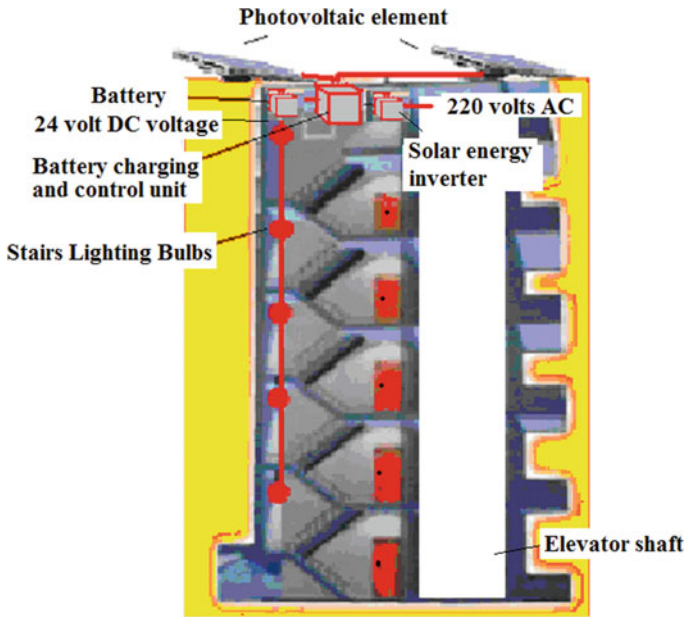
Stair lighting application of buildings in earthquake risk areas
